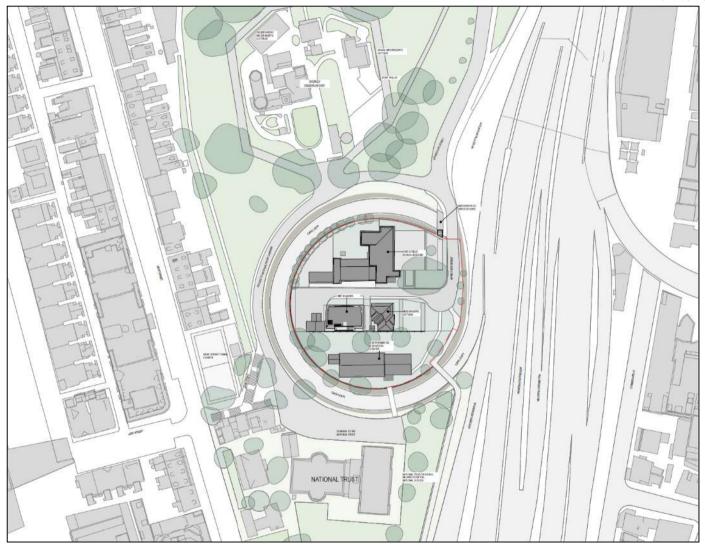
Existing Site Plan (Source: FJMT Studio, 18.12.2019)
